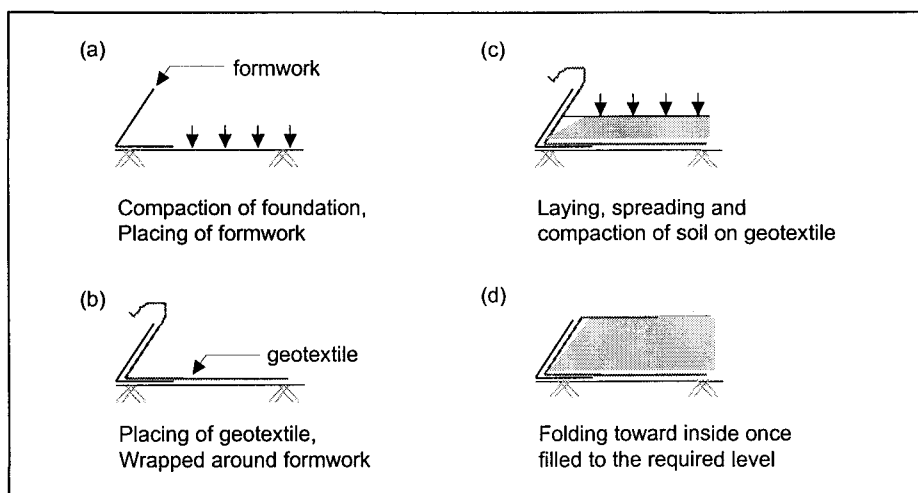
Construction procedure of a geotextile reinforced soil layer
